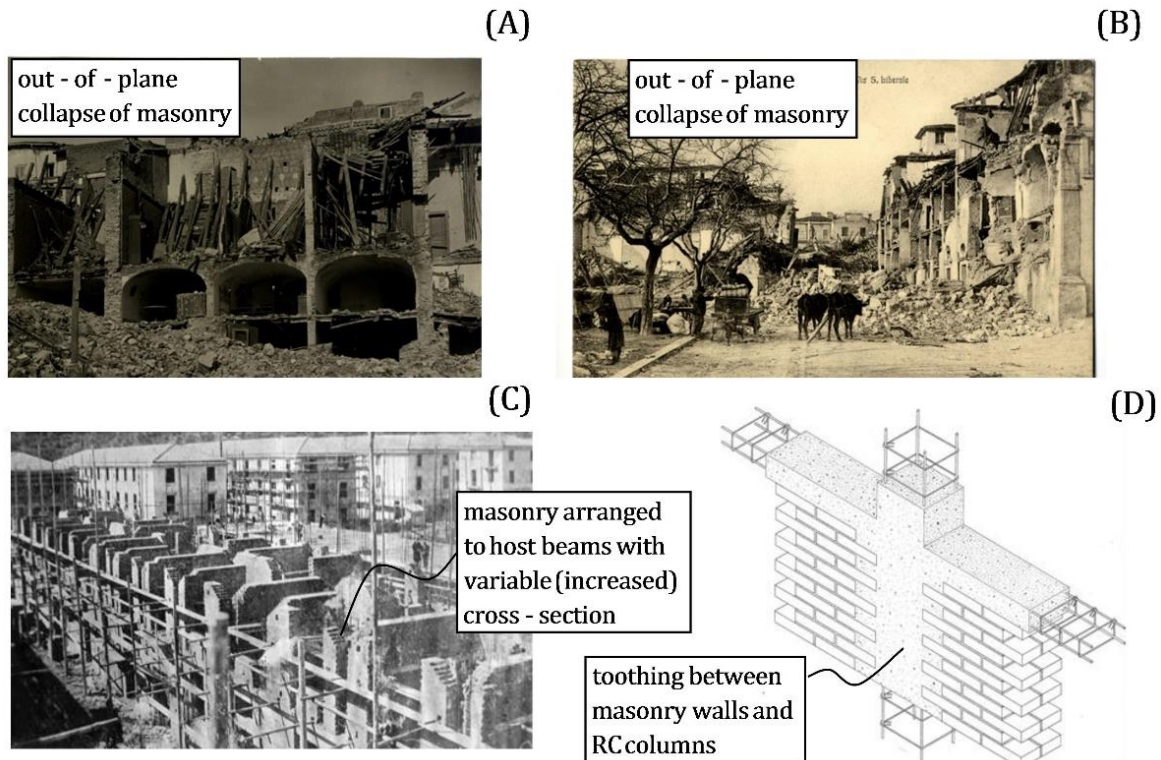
Out-of-plane collapse of masonry buildings in the Messina 1908 earthquake (A), (B), and typical structural scheme adopted in the re-construction of the city with masonry walls and confining (collaborating) RC beams and columns casted in a later stage than the masonry walls (C), (D)
